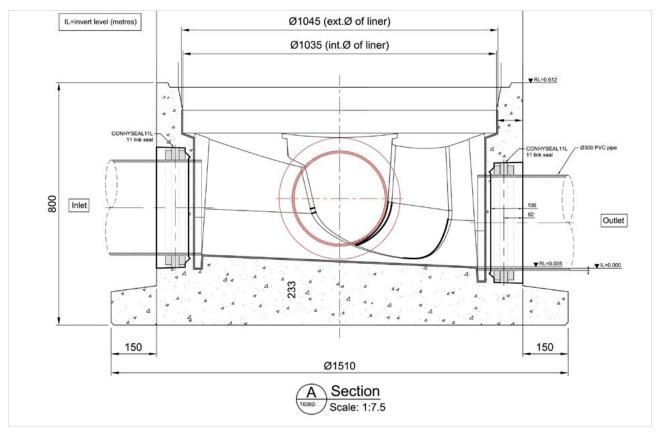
Section A-A with Inlet and Outlet of Ø300mm PVC Hybencher
